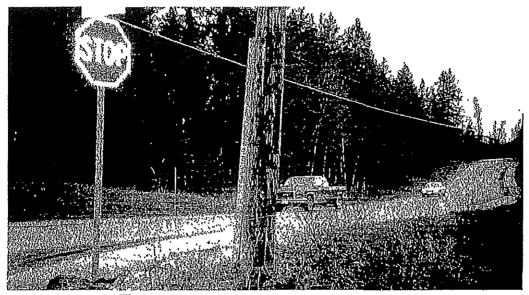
11TH STREET SE AND OKANAGAN AVENUE E LOOKING EAST View from 11th Street SE looking east while stopped and waiting to enter Okanagan Avenue E. Good sight lines are available to see oncoming vehicles.
